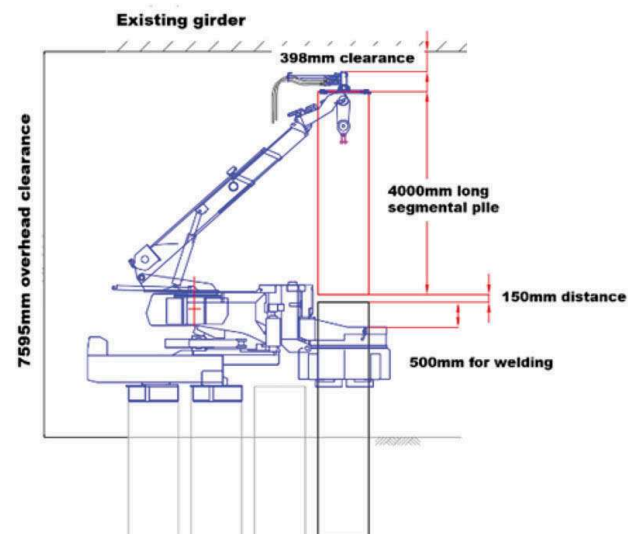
Allowable pile length beneath the girder at pier P2 (7.0m clearance).
